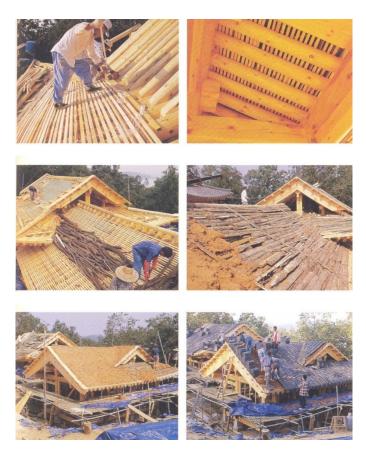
Roof construction, it provide the roof thickness about 30 centimeter ( (D. K. Kim 2004)
